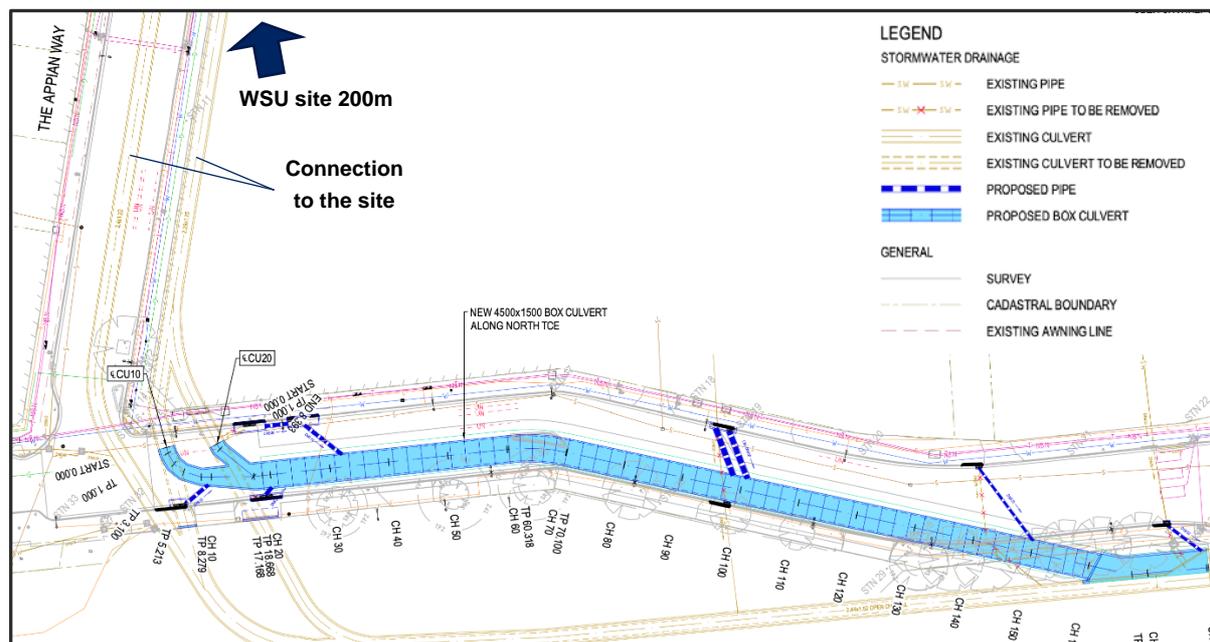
| Council's current plan for stormwater upgrade works, including box culvert and associated connections, under North Terrace (Source: Council)
